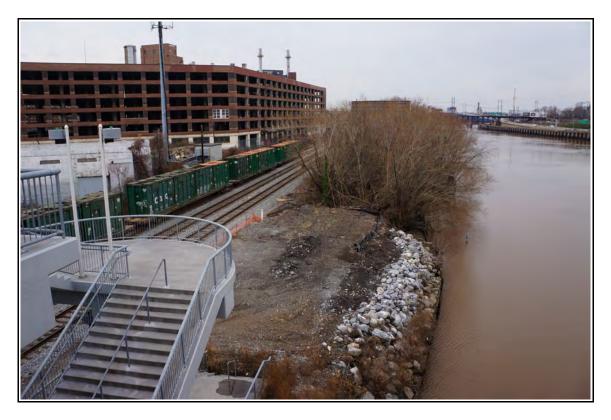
View of proposed Plaza Area and the north end of proposed trail extension
